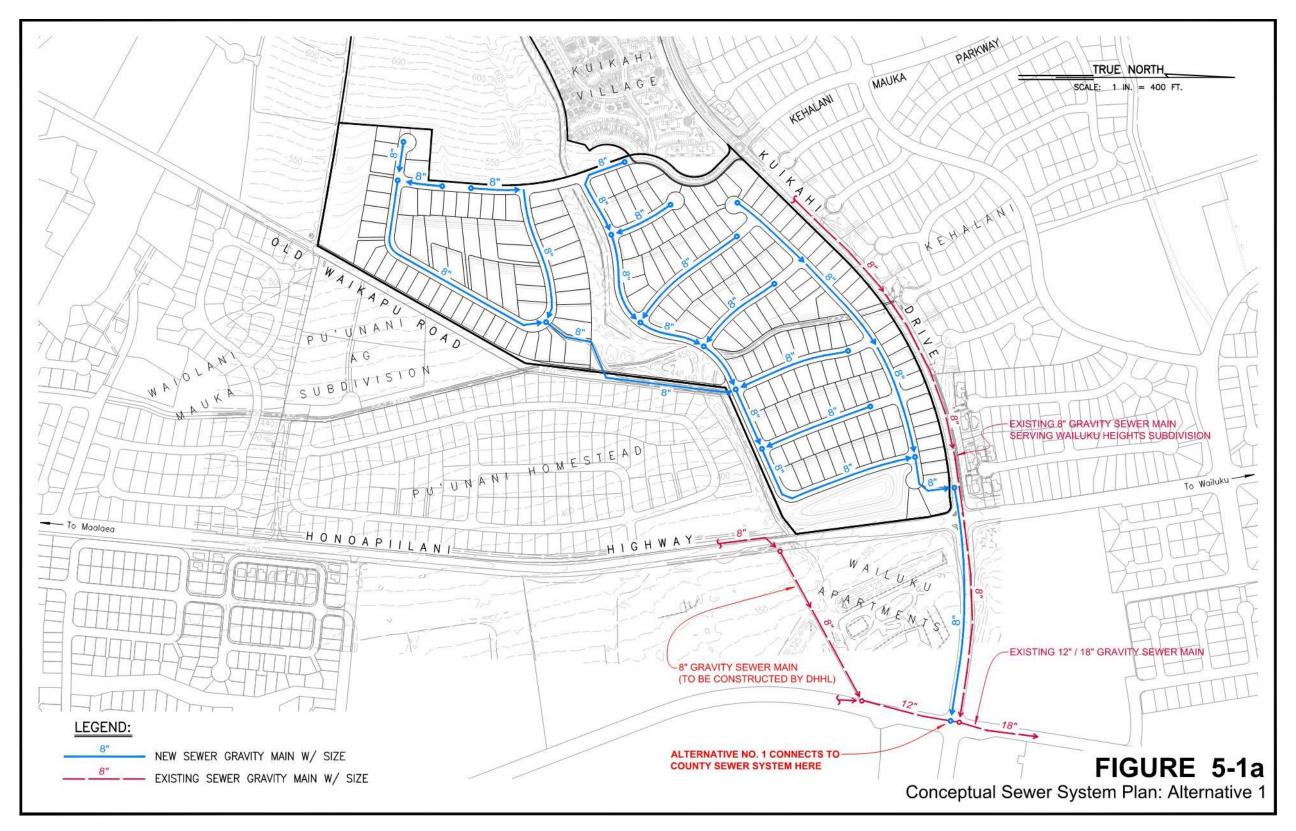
Conceptual Sewer System Plan: Alternative 1
